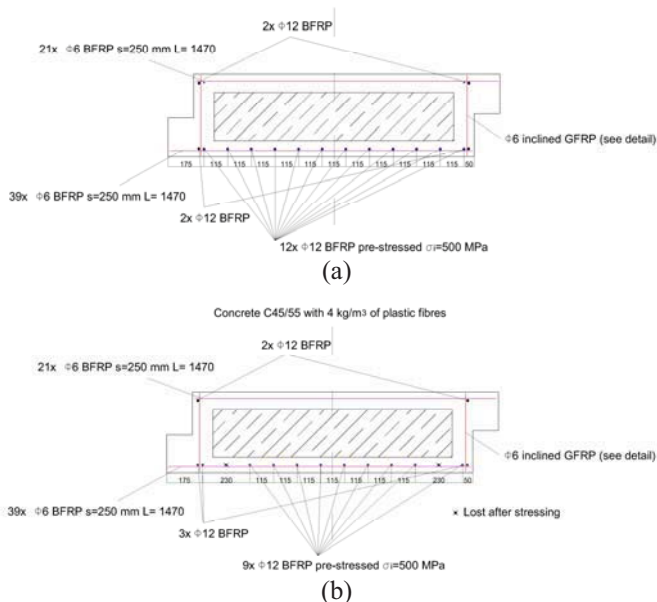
Slab beam cross section: (a) designed, (b) realised.
